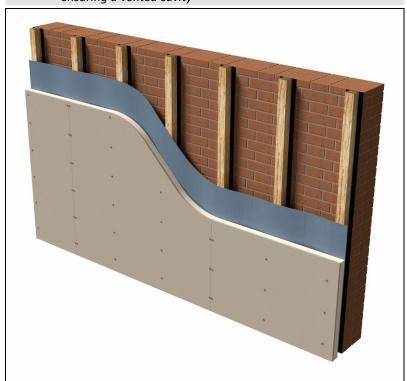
PL4000 mechanically fixed to existing solid masonry walls ensuring a vented cavity
